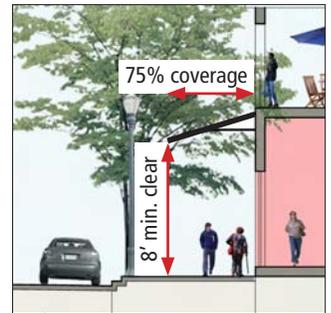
Awning section with minimum clear height above sidewalk & desired coverage.
